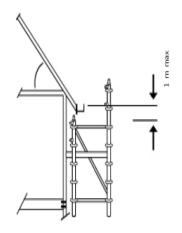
Scaffolding as edge protection for roofs greater than 35 degrees pitch (end guardrail omitted for clarity).
